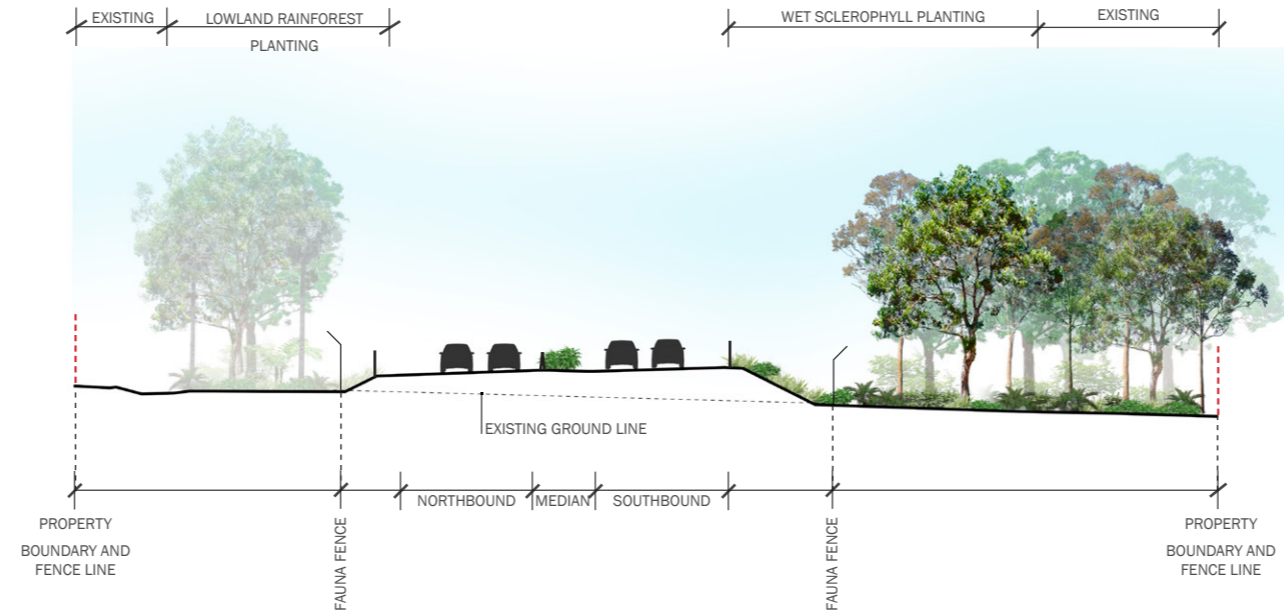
Cross section F-F in Wardell (Scale 1:400) Note: Fence locations and types are to be confirmed, and subject to further design development
